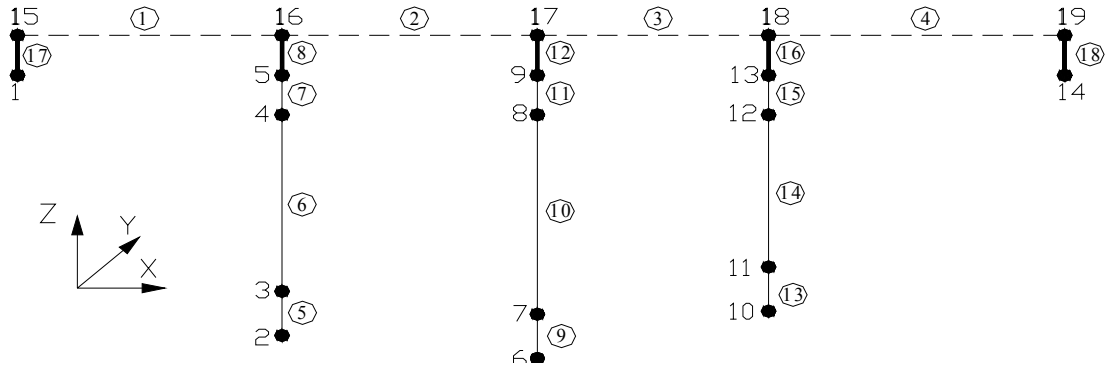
Nodal and Element Number of a Bridge with Rubber Pads
